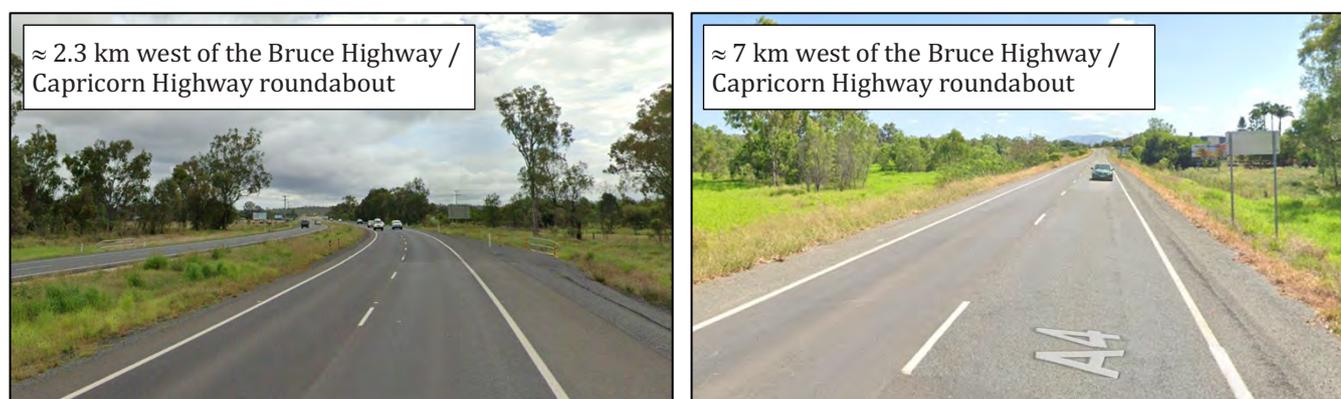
Capricorn Highway pavement conditions in year 2022 at various locations [Source: Google Street View]
